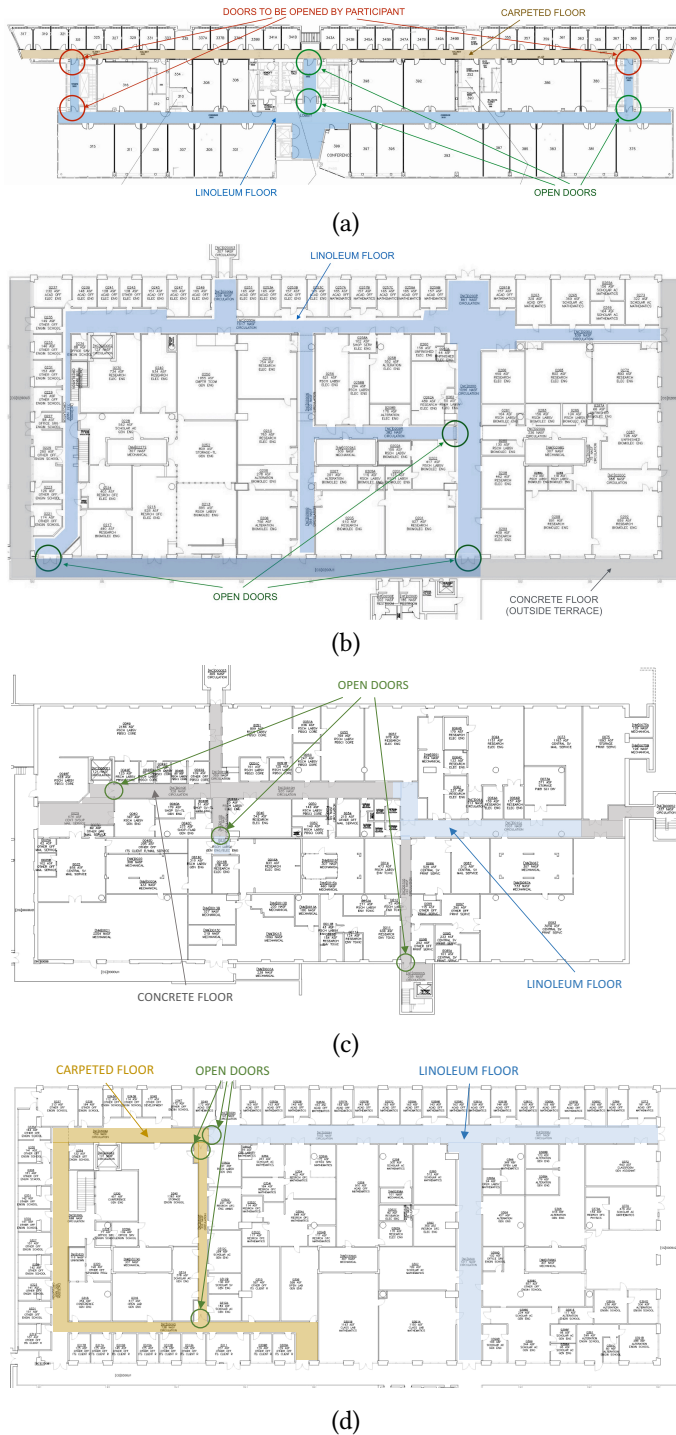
The floor plans of the locations where data collection took place. (a): E2 3rd floor. (b) BE 2nd floor. (c) BE basement. (d) BE 3rd floor.
